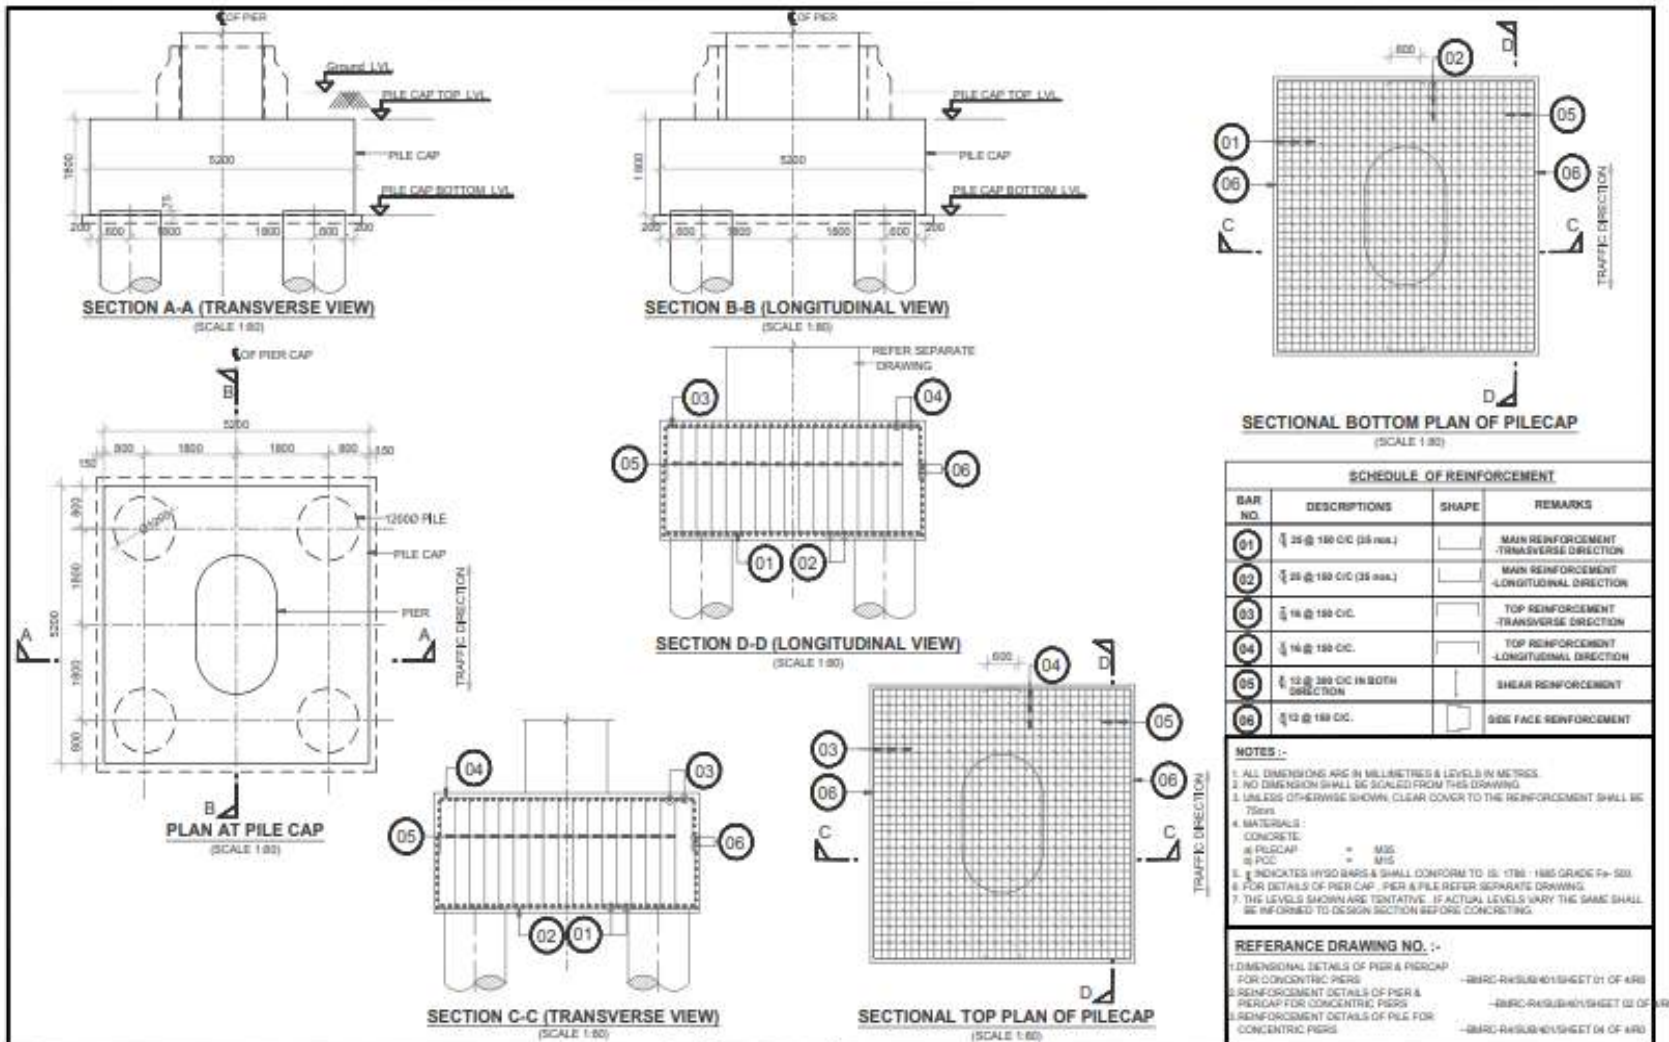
Foundation Details of Metro Pillars along Kanakapura road near Konankunte cross junction
